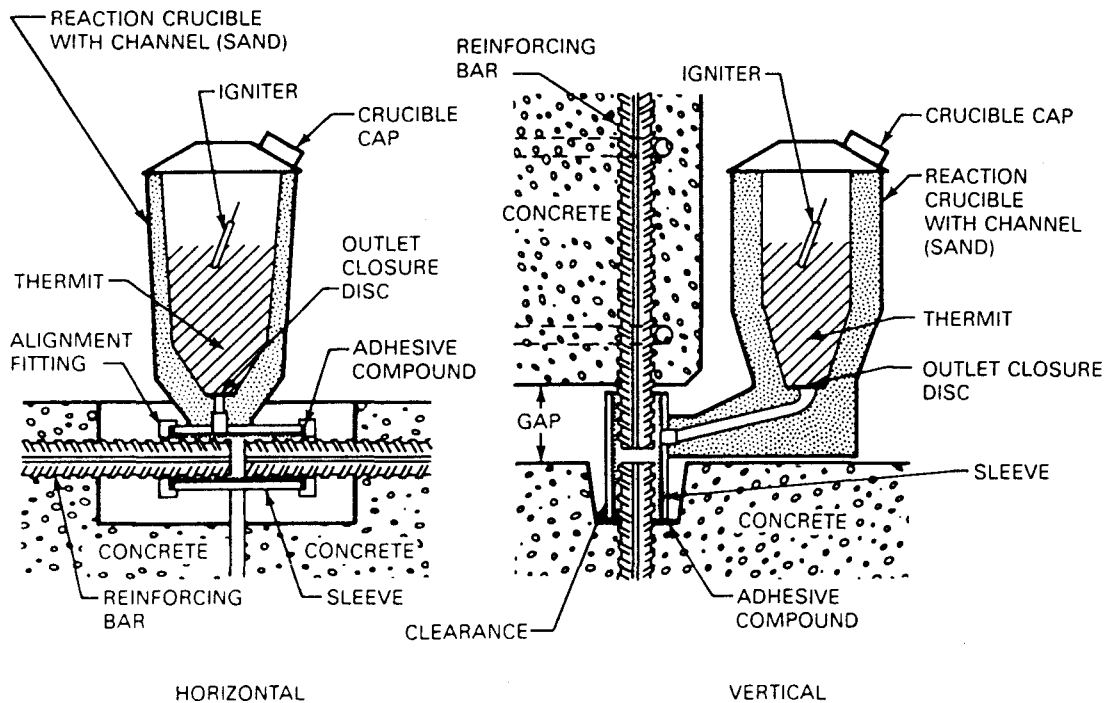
Thermit Sleeve Joint for Reinforcing Bars
